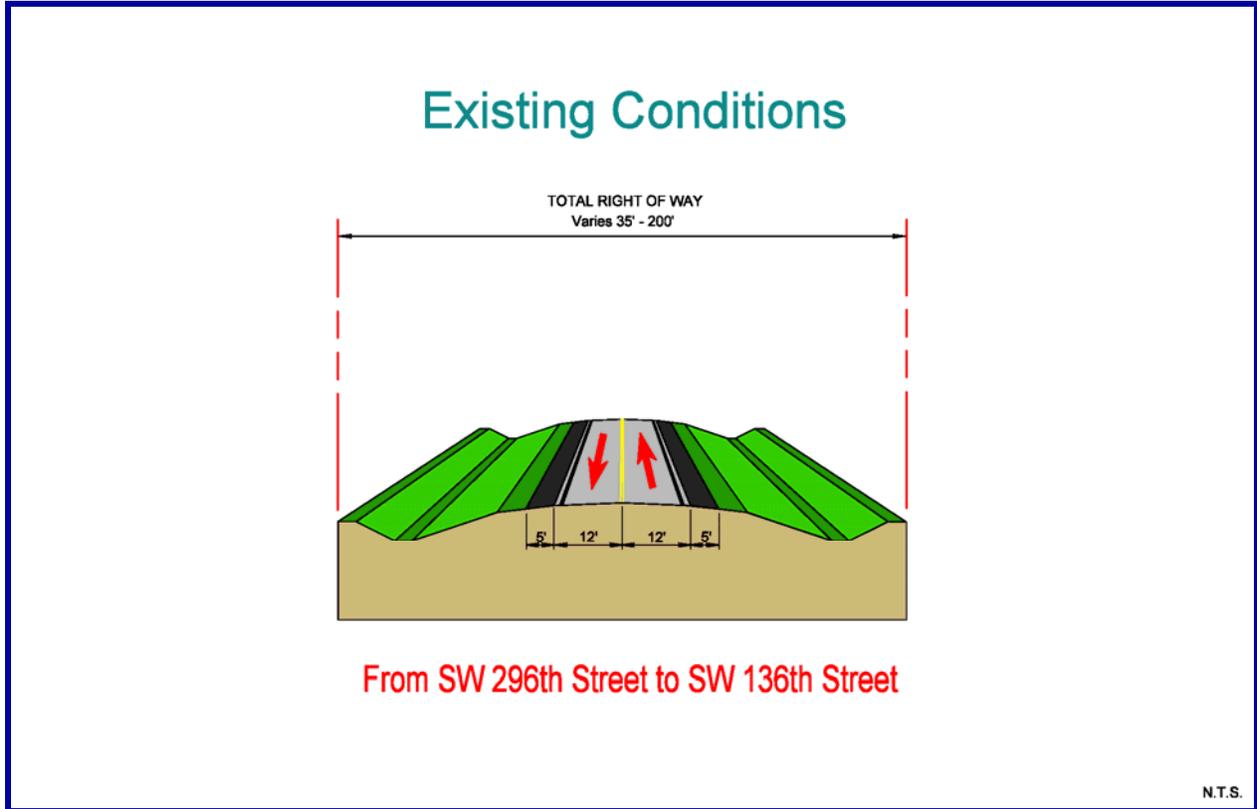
Existing Two-Lane Rural Typical Roadway Section
